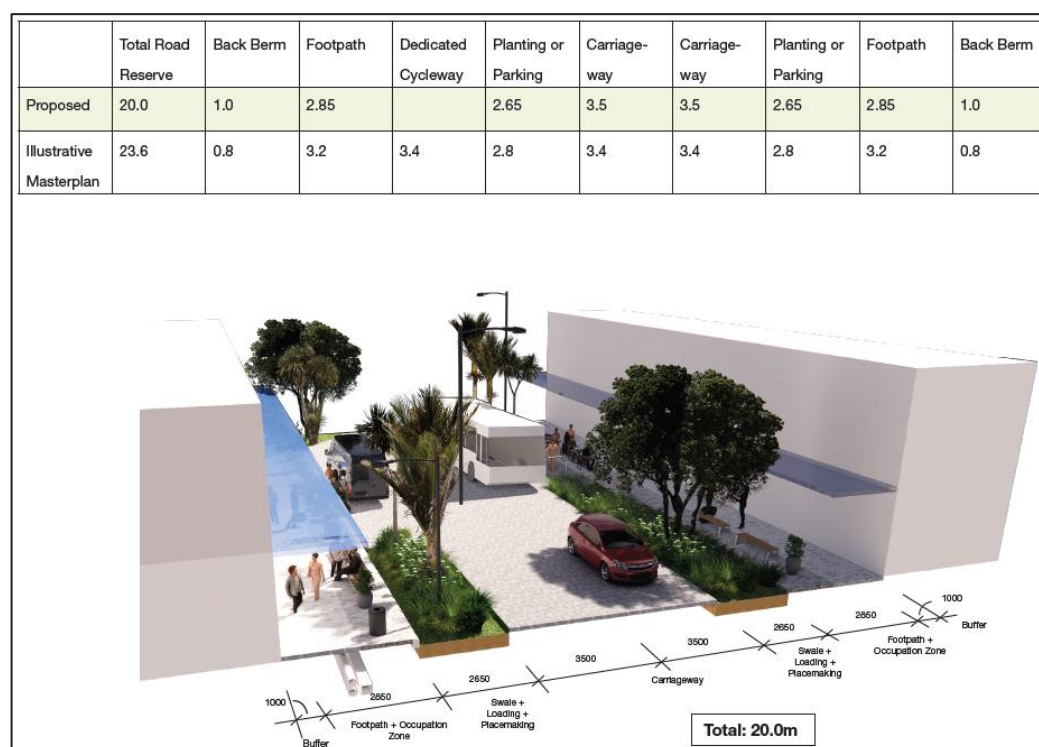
Road design table and illustrative cross-section for Primary Collector Road (Village Centre).
